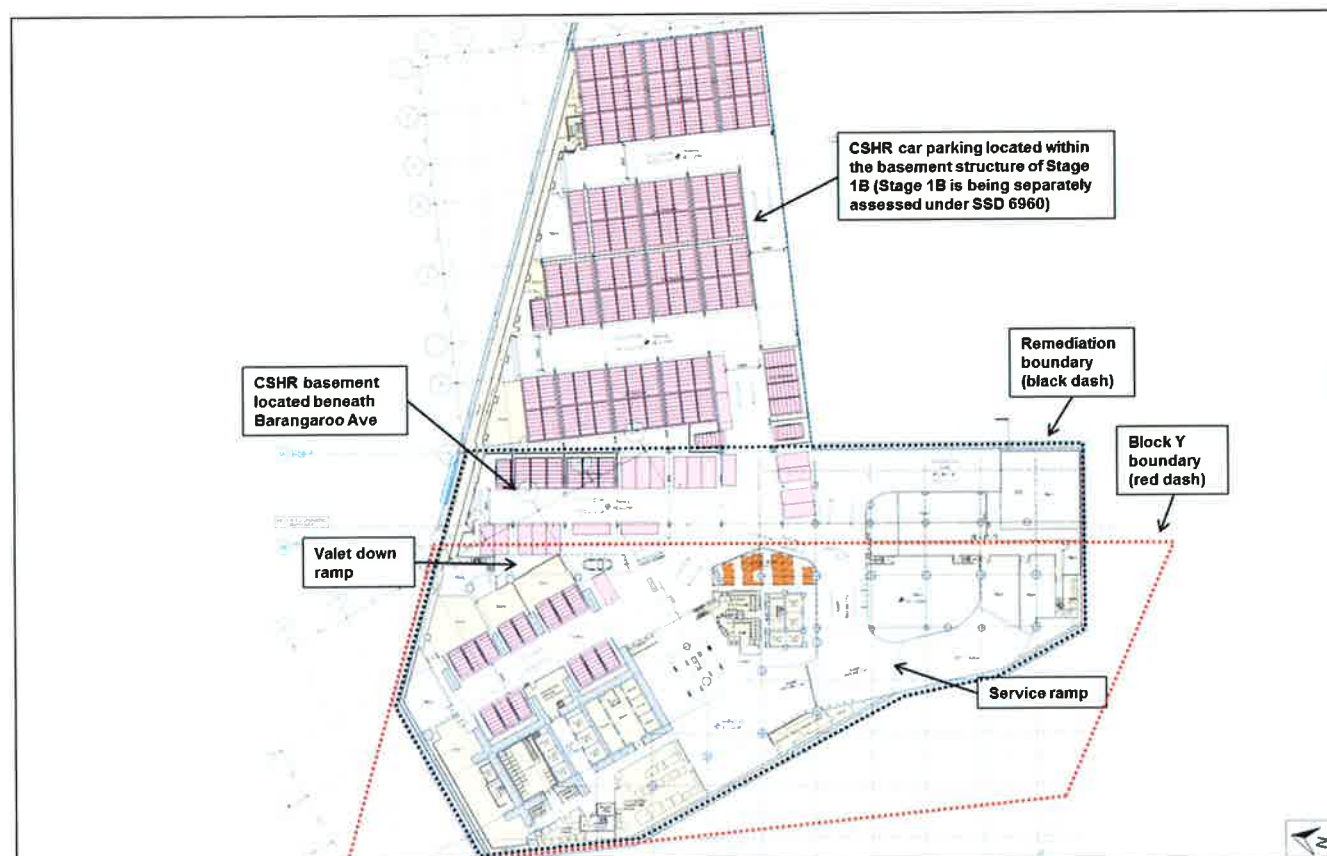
Proposed basement floor layout (Base source: Applicant's EIS)
